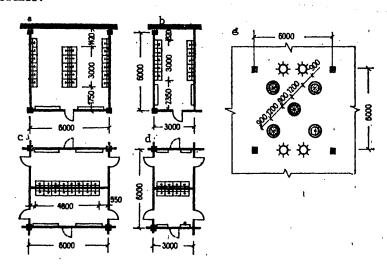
Layout elements of wash rooms. a-d -- with straightsided wash basins 6×6 meters (a, c); 6×3 meters (b, d); e -- with circular group wash basins 6×6 meters
